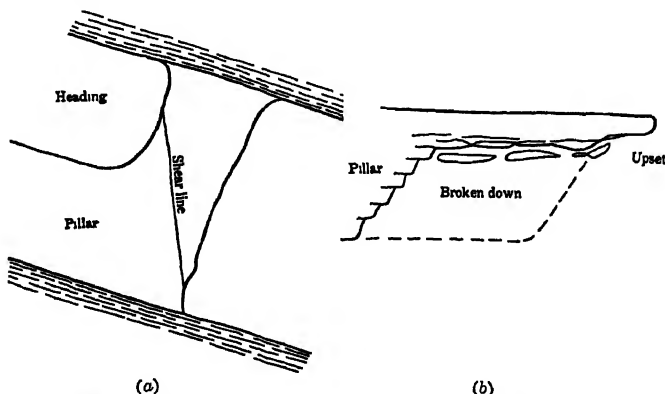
(a) SHEAR LINE CUTTING PILLAR SHOWING TENDENCY TO OVERTURN. (b) END OF PILLAR FAILING UNDER PRESSURE, PARALLEL TO DIP AND STRIKE.
